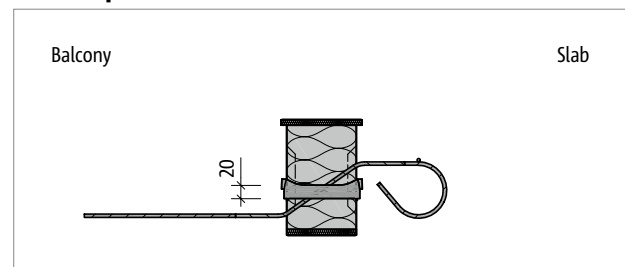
Schöck Isokorb® XT type Q-V1 to V4: Product section
